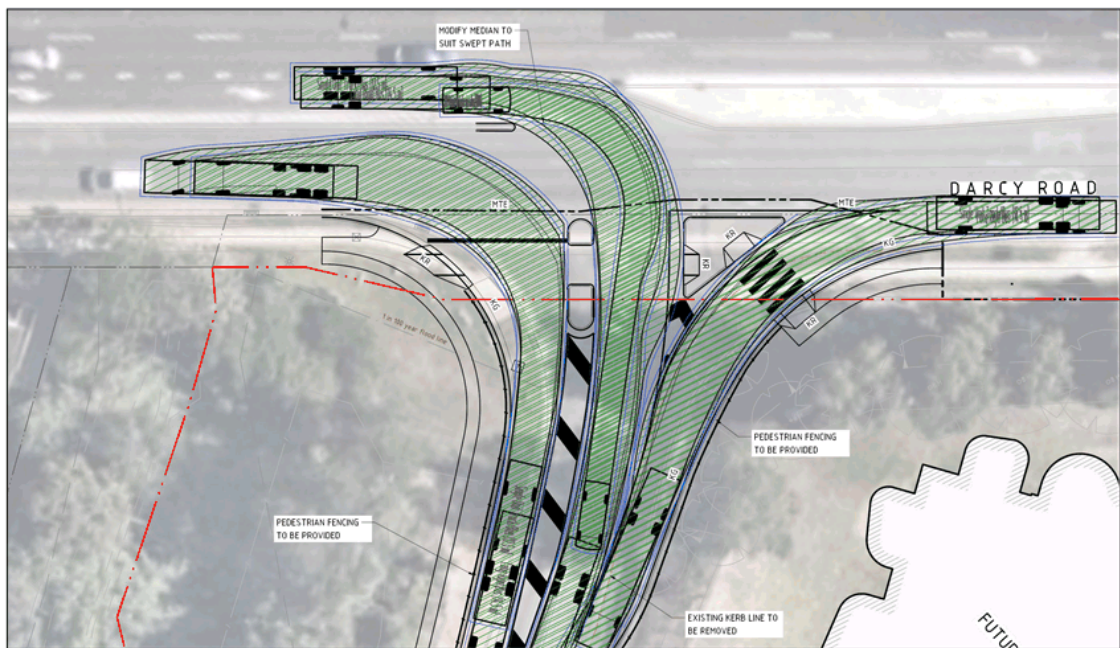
A swept path assessment of the proposed intersection works at the access road and Darcy Road intersection.
